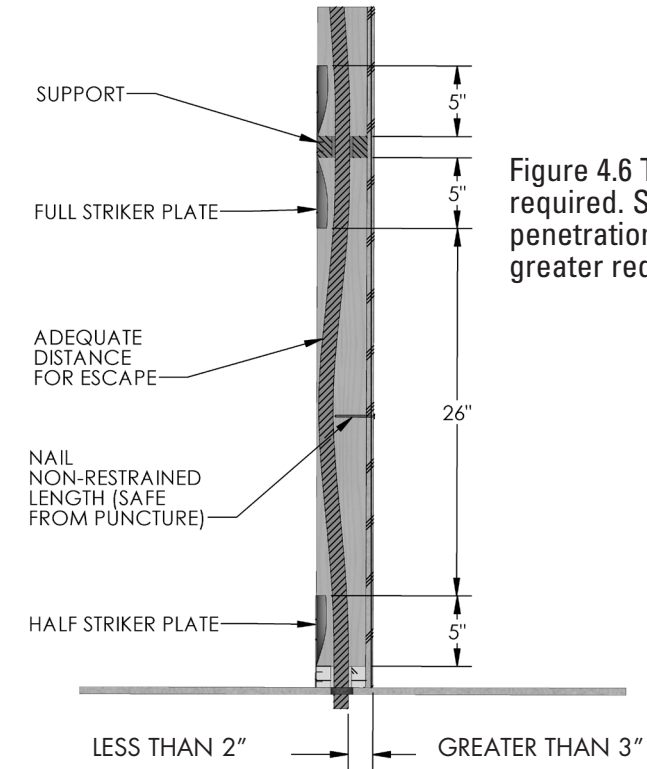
Typical locations where striker plates are required. Striker plates are installed at both horizontal penetrations unrestrained vertical runs of 26 inches or greater require no additional protection.
